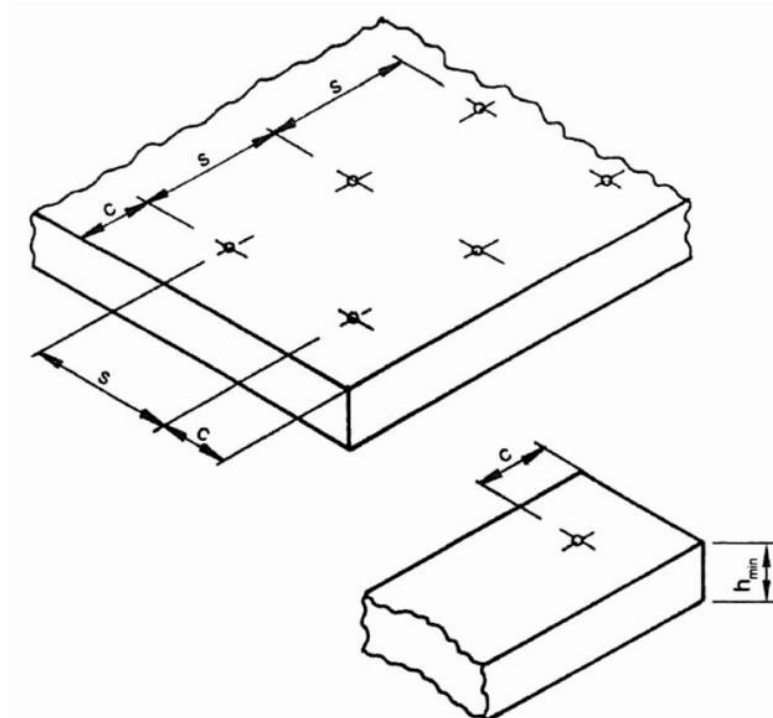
Parameters of TSA, TSA P, TSA L, TSAE and TSAH fasteners spacing and edge distance
